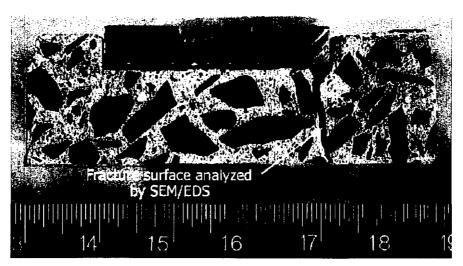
Core 122—Cross-Section View Showing Fracture along Crack
